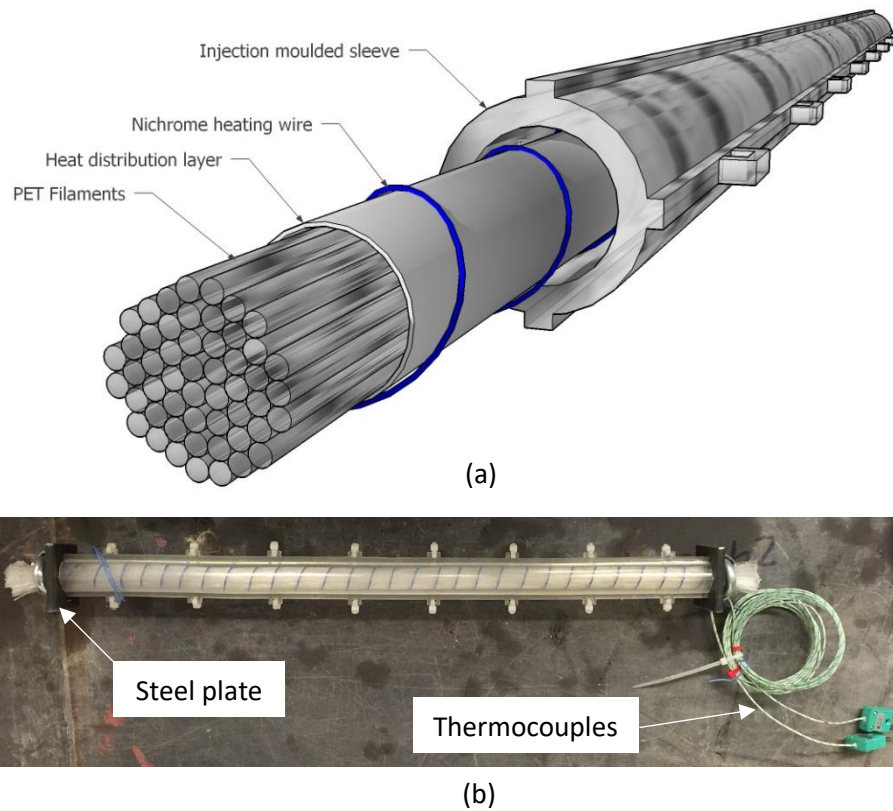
Shape memory PET tendon concrete crack closure system (a) schematic (b) photo.
